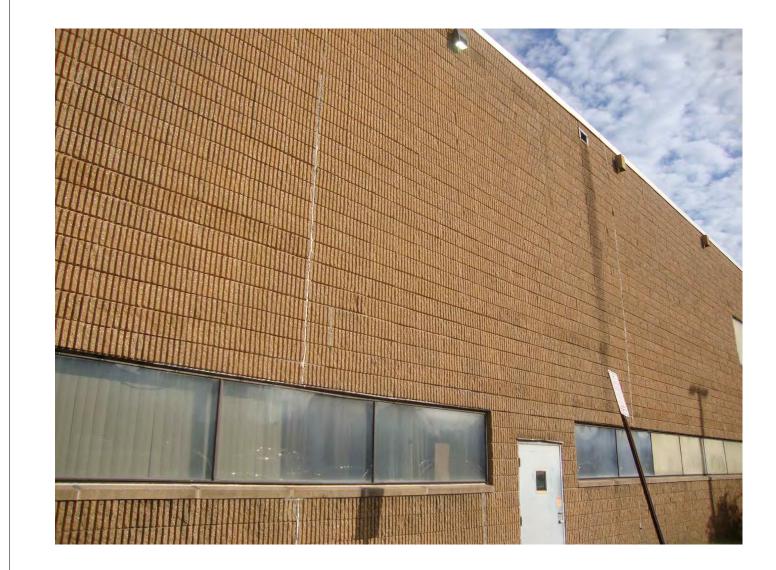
SPLIT FACE FLUTED BLOCK AT WALL
